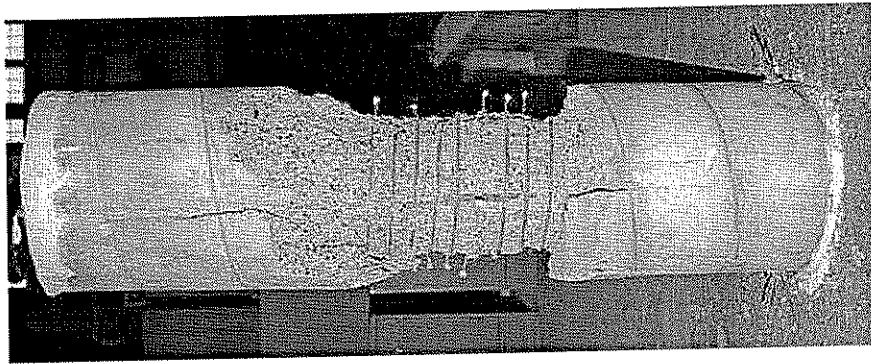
Schematic drawing of post-test appearance of Specimen 14-E<sup>1</sup>.
